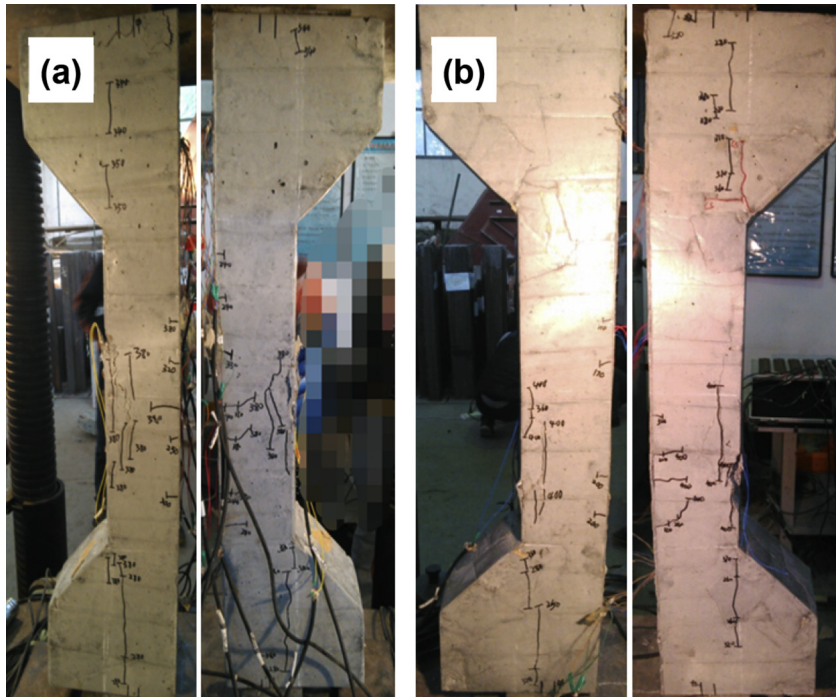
Failure of ordinary plain concrete specimens under small eccentricity ($e = 20$ mm): (a) OPCC-SE1; (b) OPCC-SE2.
